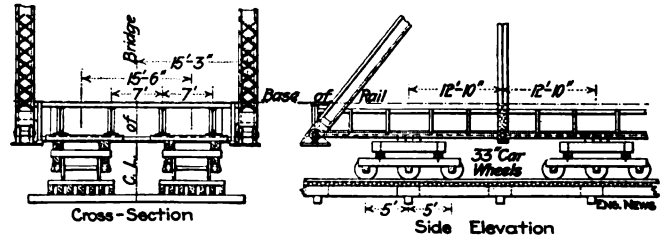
ARRANGEMENT OF TRUCKS UNDER THE BRIDGE SPANS FOR MOVING THE SPANS LONGITUDINALLY 123 FT.
